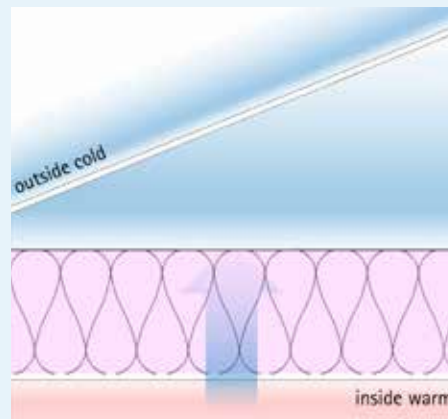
Water vapour from inside the house can diffuse upwards through the ceiling and insulation layers.
